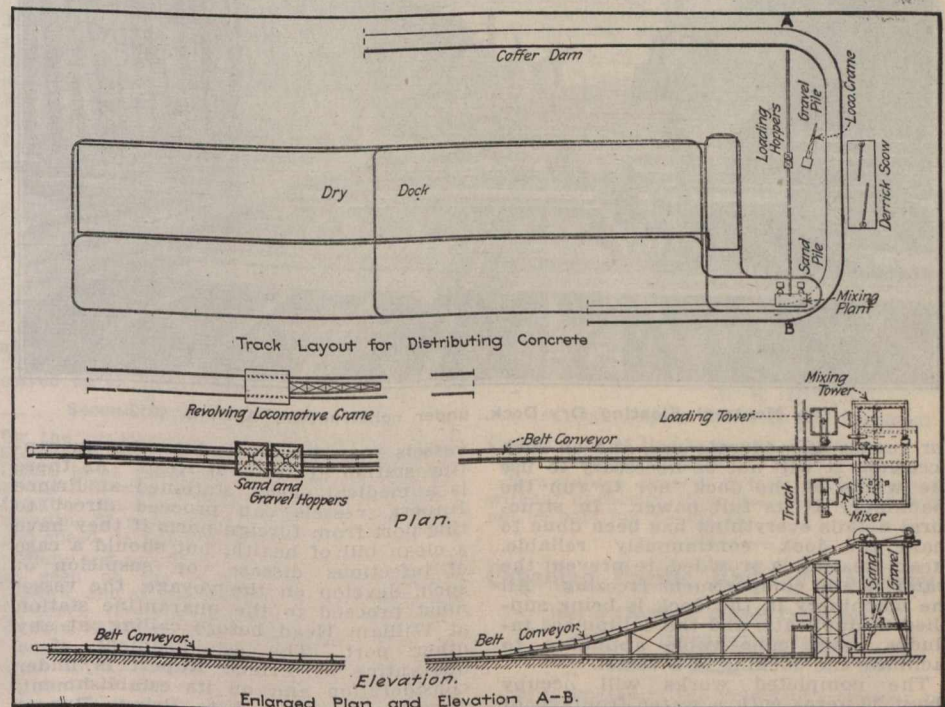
Arrangement of Construction Plant for Mixing and Handling Concrete.
